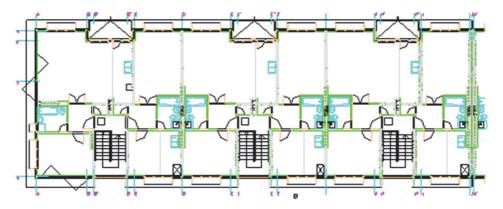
Layout of typical multi-story masonry building from 1950's, ground floor + 4 or 5 floors
